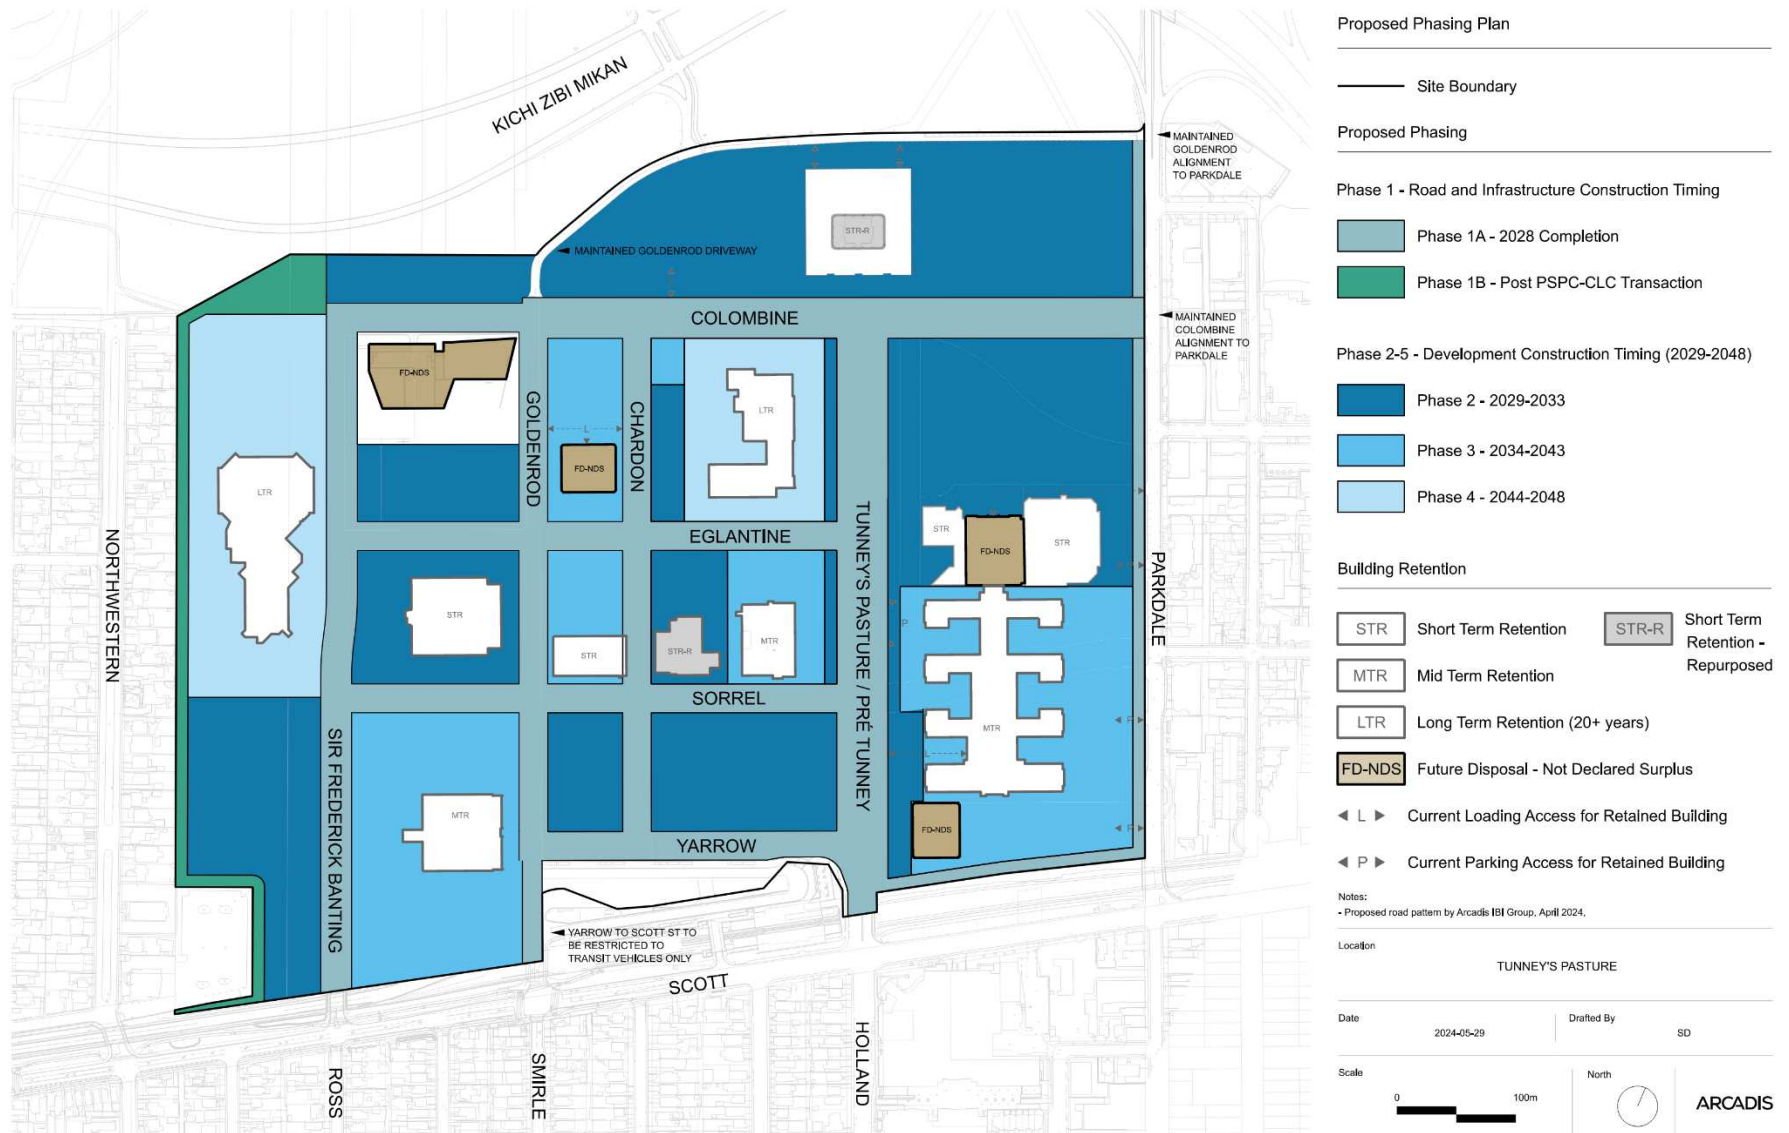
Proposed Phasing Plan For Tunney's Pasture Campus (All Phases, Drawing 1)
